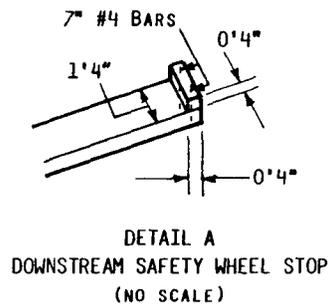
Construction detail of precast concrete ramp planks (part 1).
